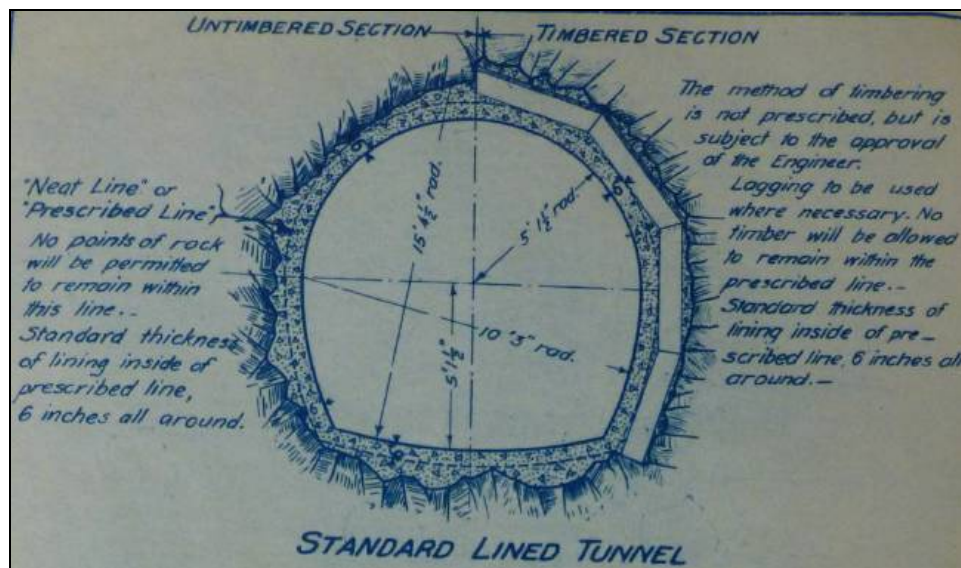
Standard cross section planned for Mountain Tunnel. Plan dated June 16, 1917 and signed by M.M. O'Shaughnessy.
